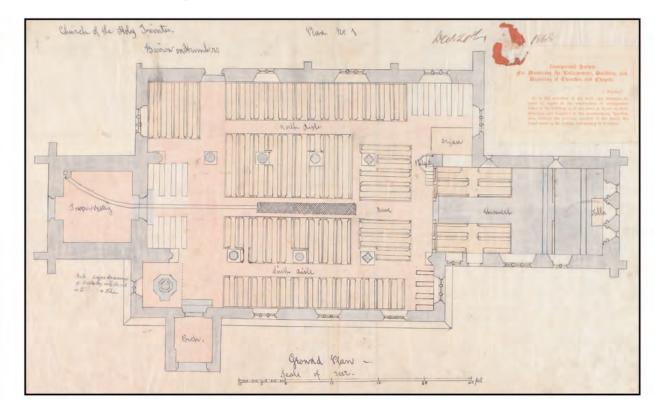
Holy Trinity, Barrow-upon-Humber. Plan of the church by Charles Kirk, showing reseating, 1868. The Trustees of Lambeth Palace Library
